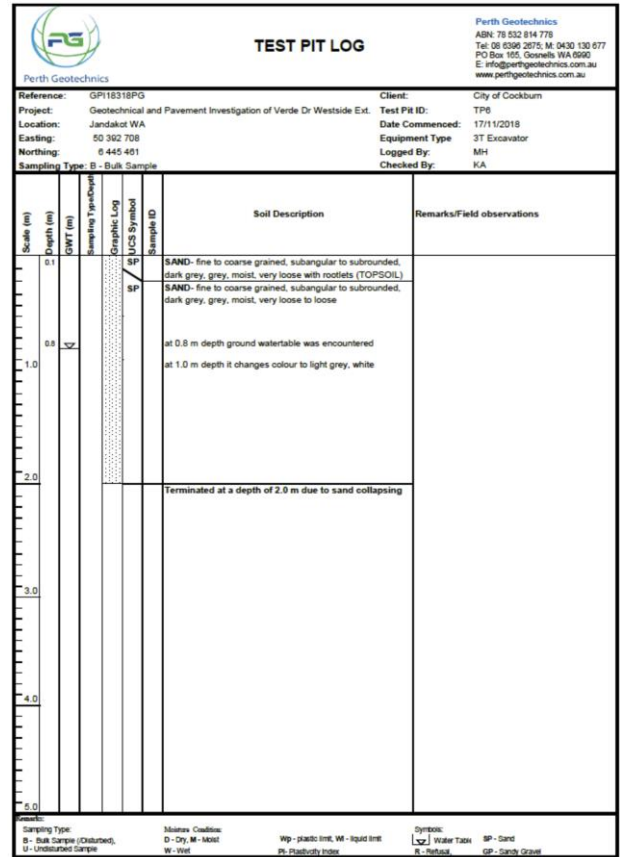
Test Pit Log (Verde Dr.) at Location TP6
